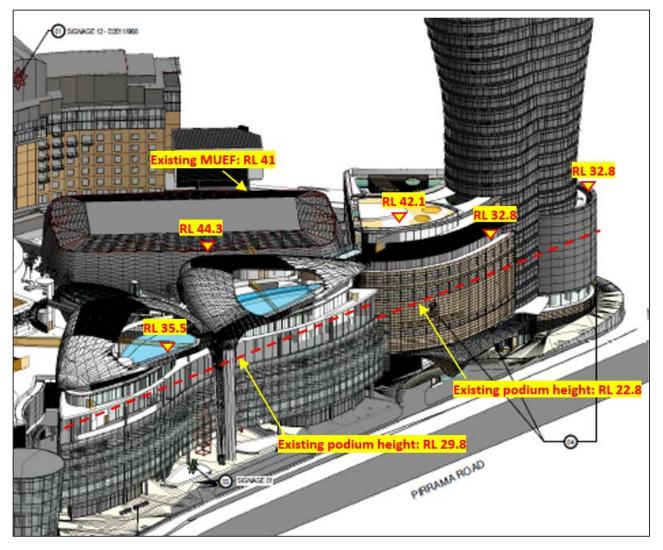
| Axonometric view showing the height of podium elements on the Pirrama Road frontage (Base source: Proponent's Architectural drawings)
